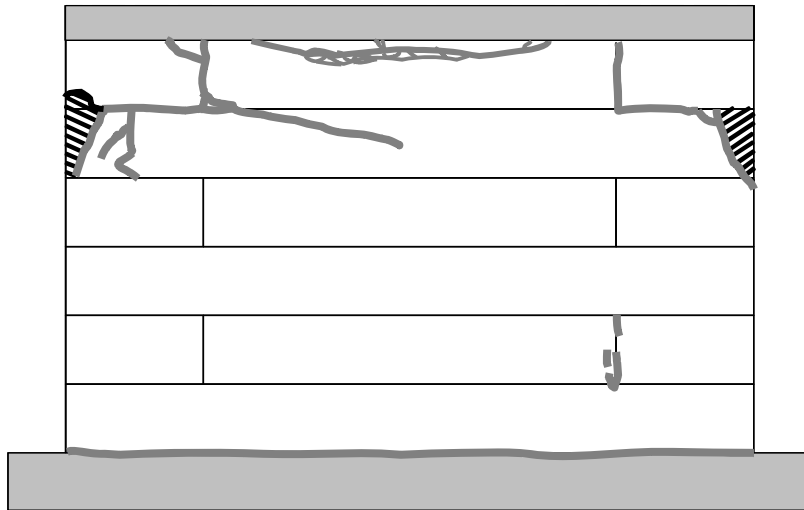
Cracking of Shear Wall Pilot Specimen 2 at Cycles 14a (spalling and crushing at ends of wall)
